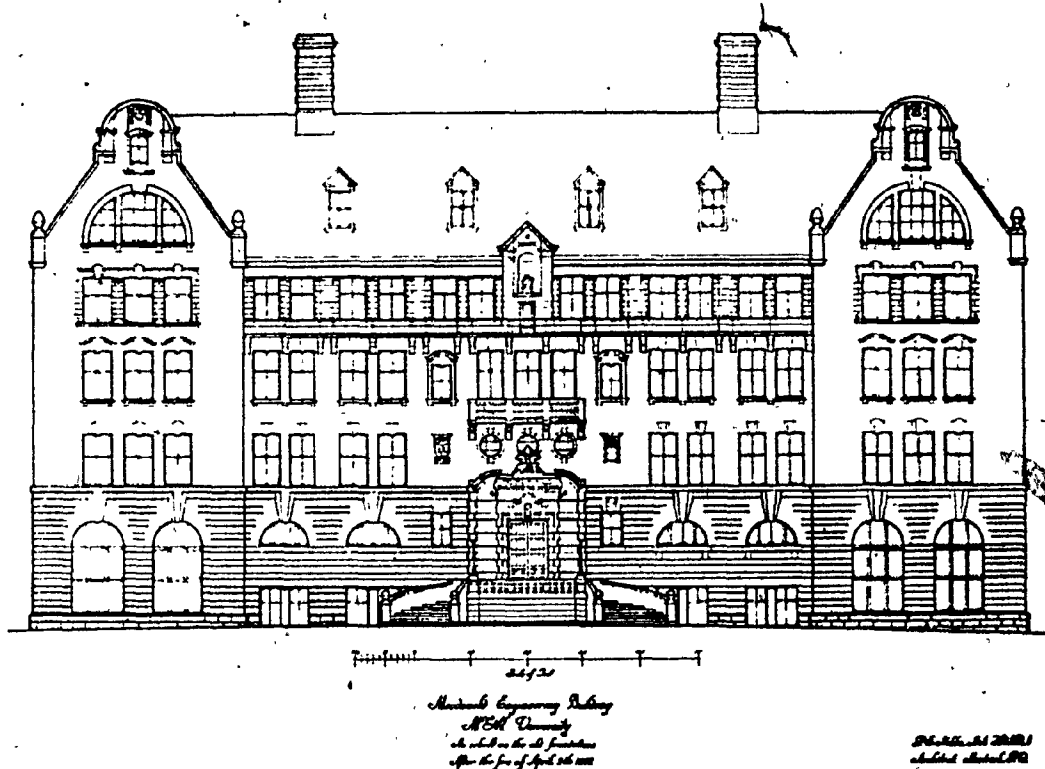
Macdonald Engineering Building. Third proposal for rebuilding - front elevation.
